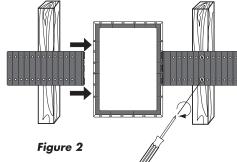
illustrates the use of the round, or in-ceiling pre-construction bracket. Figure 2 shows the use of the rectangle, or in-wall pre-construction bracket.
